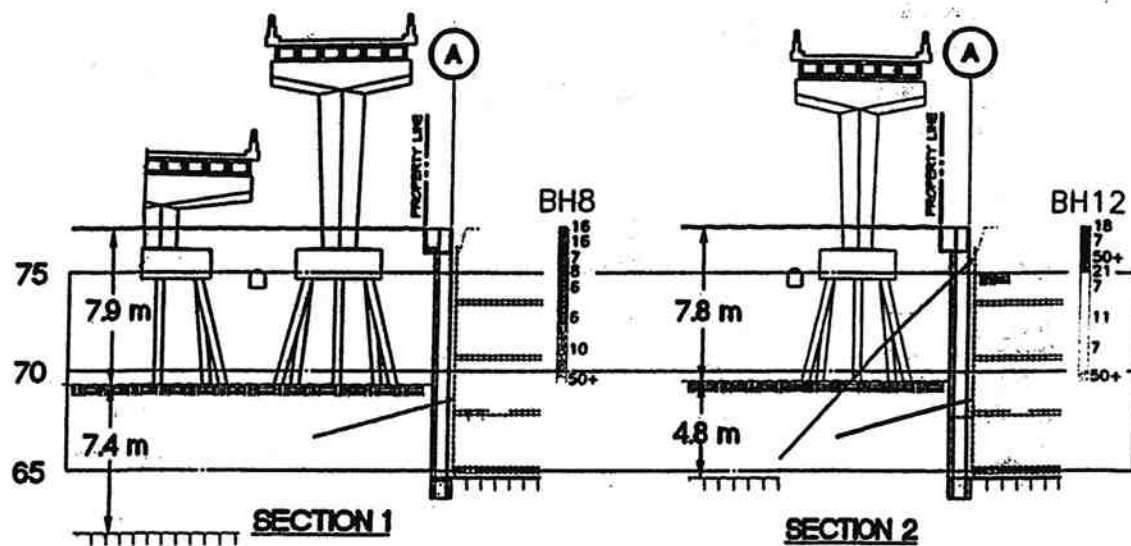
Sections showing four basement excavation at the Gardiner Expressway.
